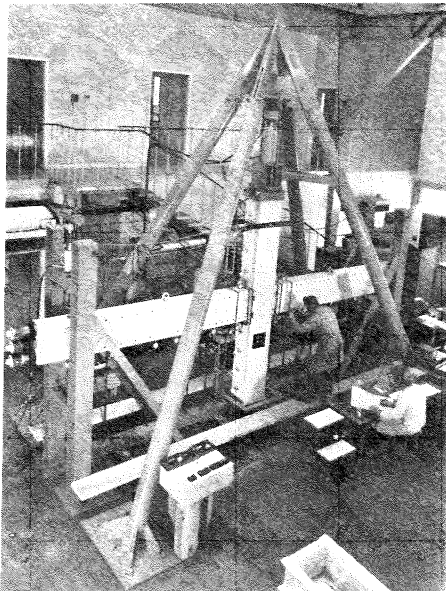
A BEAM-COLUMN UNIT UNDER TEST
